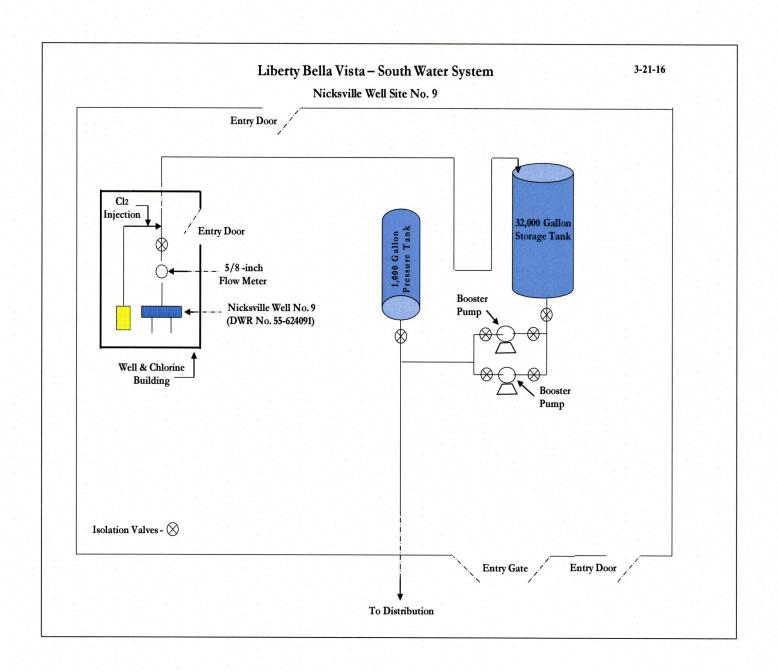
SOUTH WATER SYSTEM NICKSVILLE WELL SITE NO. 9
